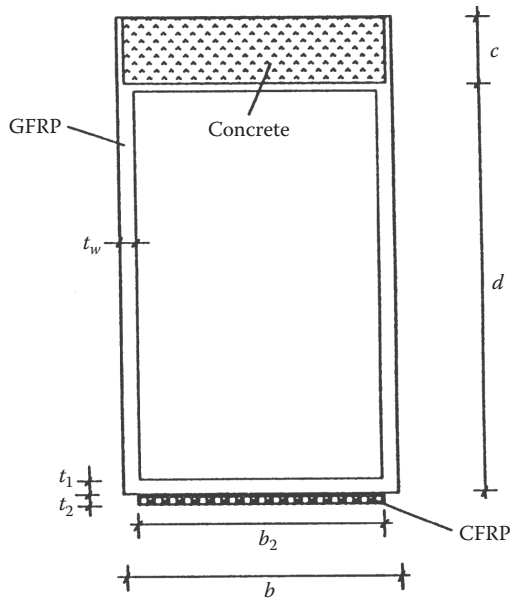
Hybrid concrete/GFRP/CFRP rectangular section. (From Triantafyllou, T.C. and Meier, U., Innovative design of FRP combined with concrete, *Proceedings of the Advanced Composite Materials in Bridges and Structures*, Neale, K.W. and Labossiere, P. (eds.), Canadian Society for Civil Engineering, Montreal, Quebec, Canada, pp. 491–499, 1992.)
